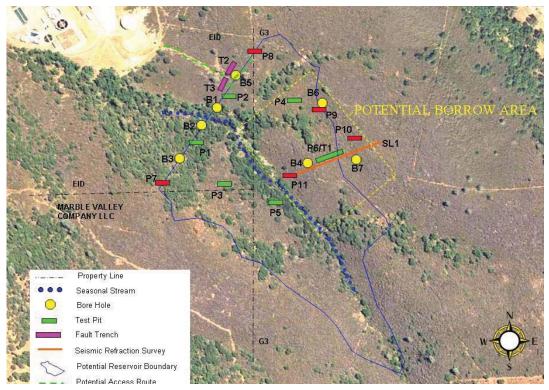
Final Plan for Geological Site Evaluation – Deer Creek Site
